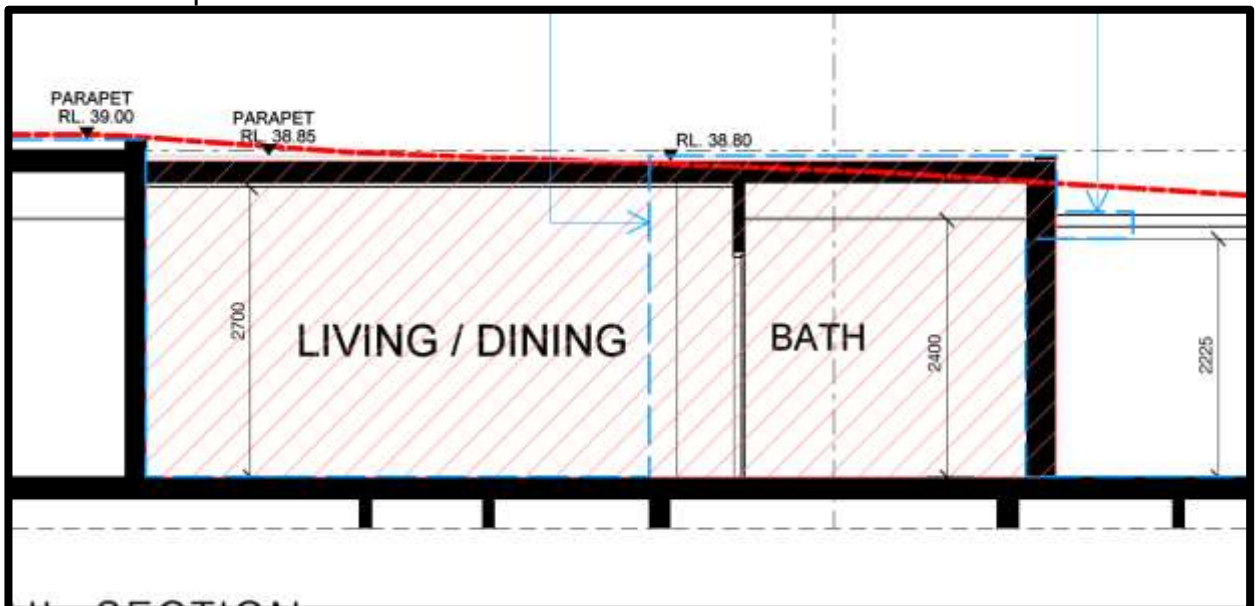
Extract of cross section plan of proposed studio layout, with living/dining and bedroom nook located behind the bathroom (Source: Locus Architects, 2020).
